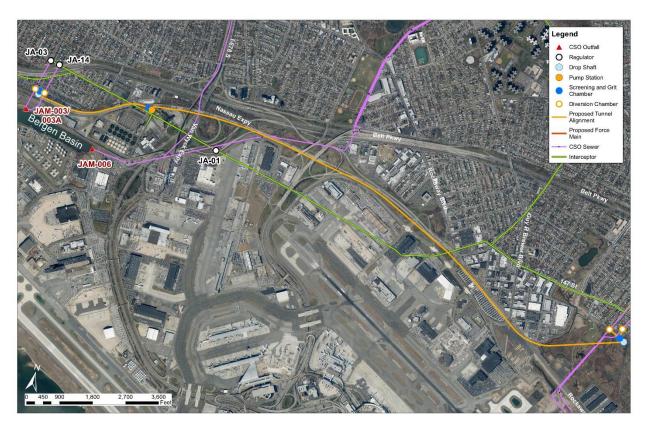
Layout of Proposed CSO Tunnel and Dewatering Pumping Station
